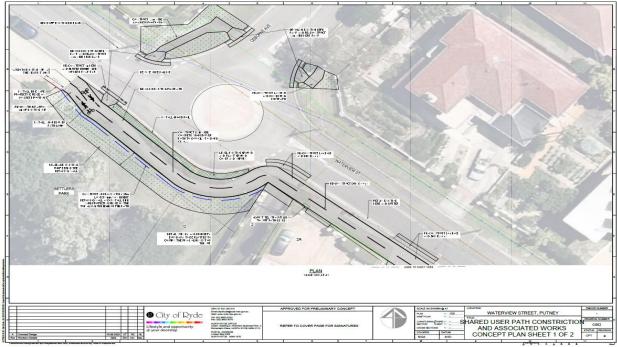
Shared User Path Construction and Associated Works Concept Plan
